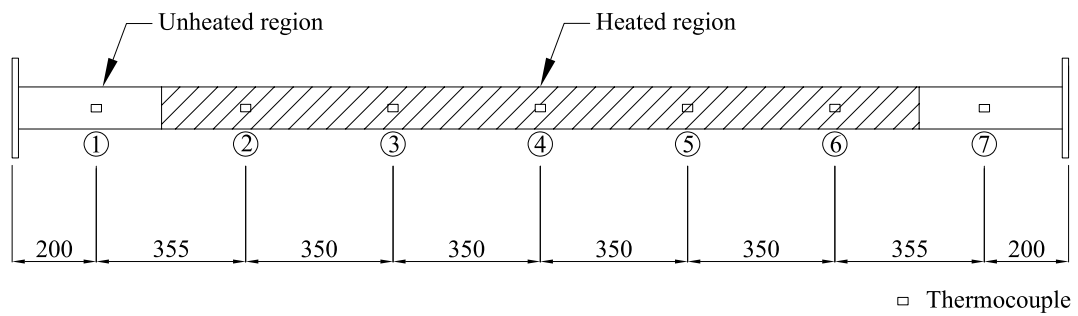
Locations of seven thermocouples mounted on specimens (dimensions in mm)
